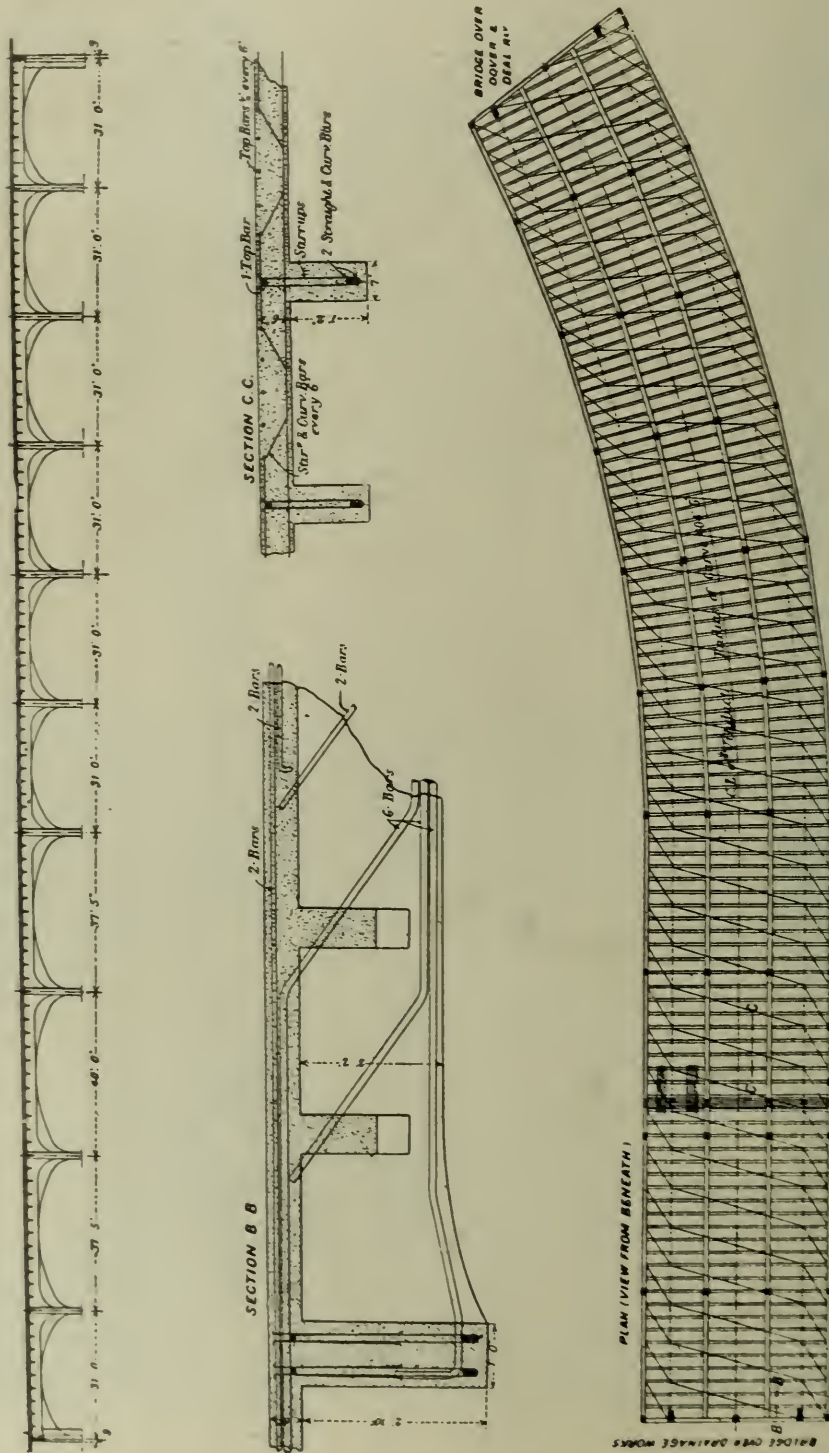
DETAILS OF VIADUCT BETWEEN BOWSTRING GIRDER BRIDGES.
